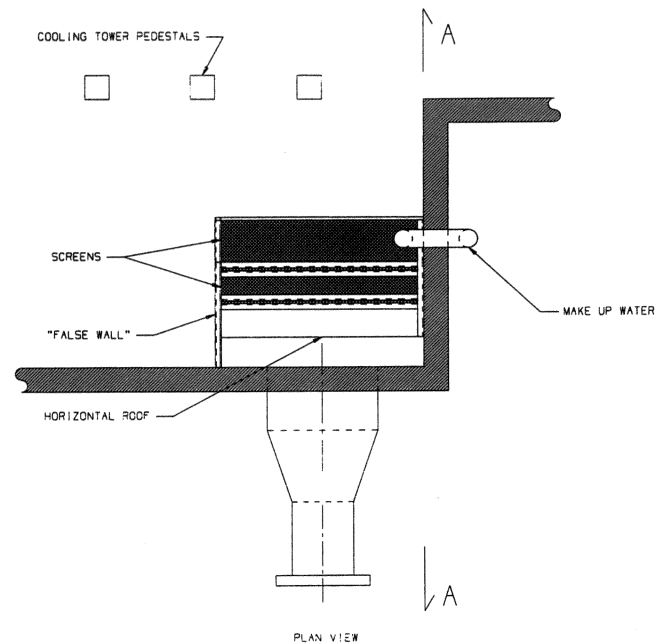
Plan View of Cooling Tower Basin with Modifications.
